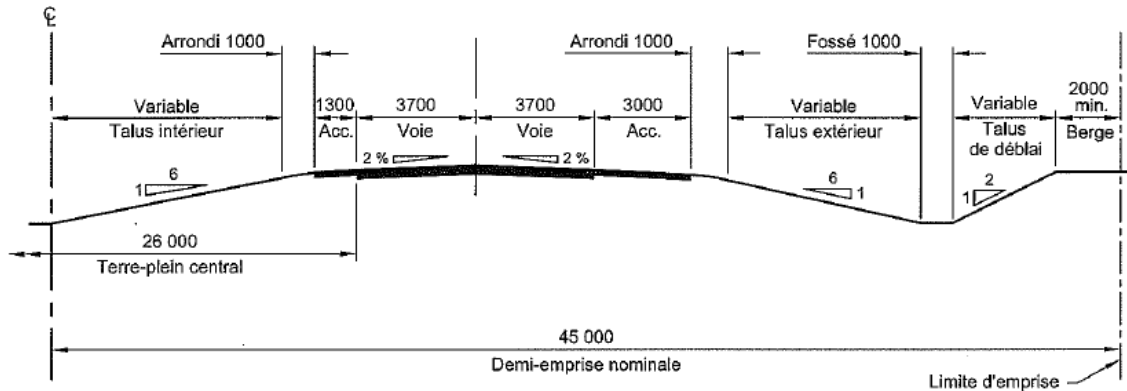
Cross-section of a 4 Lines Highway in Rural Area
